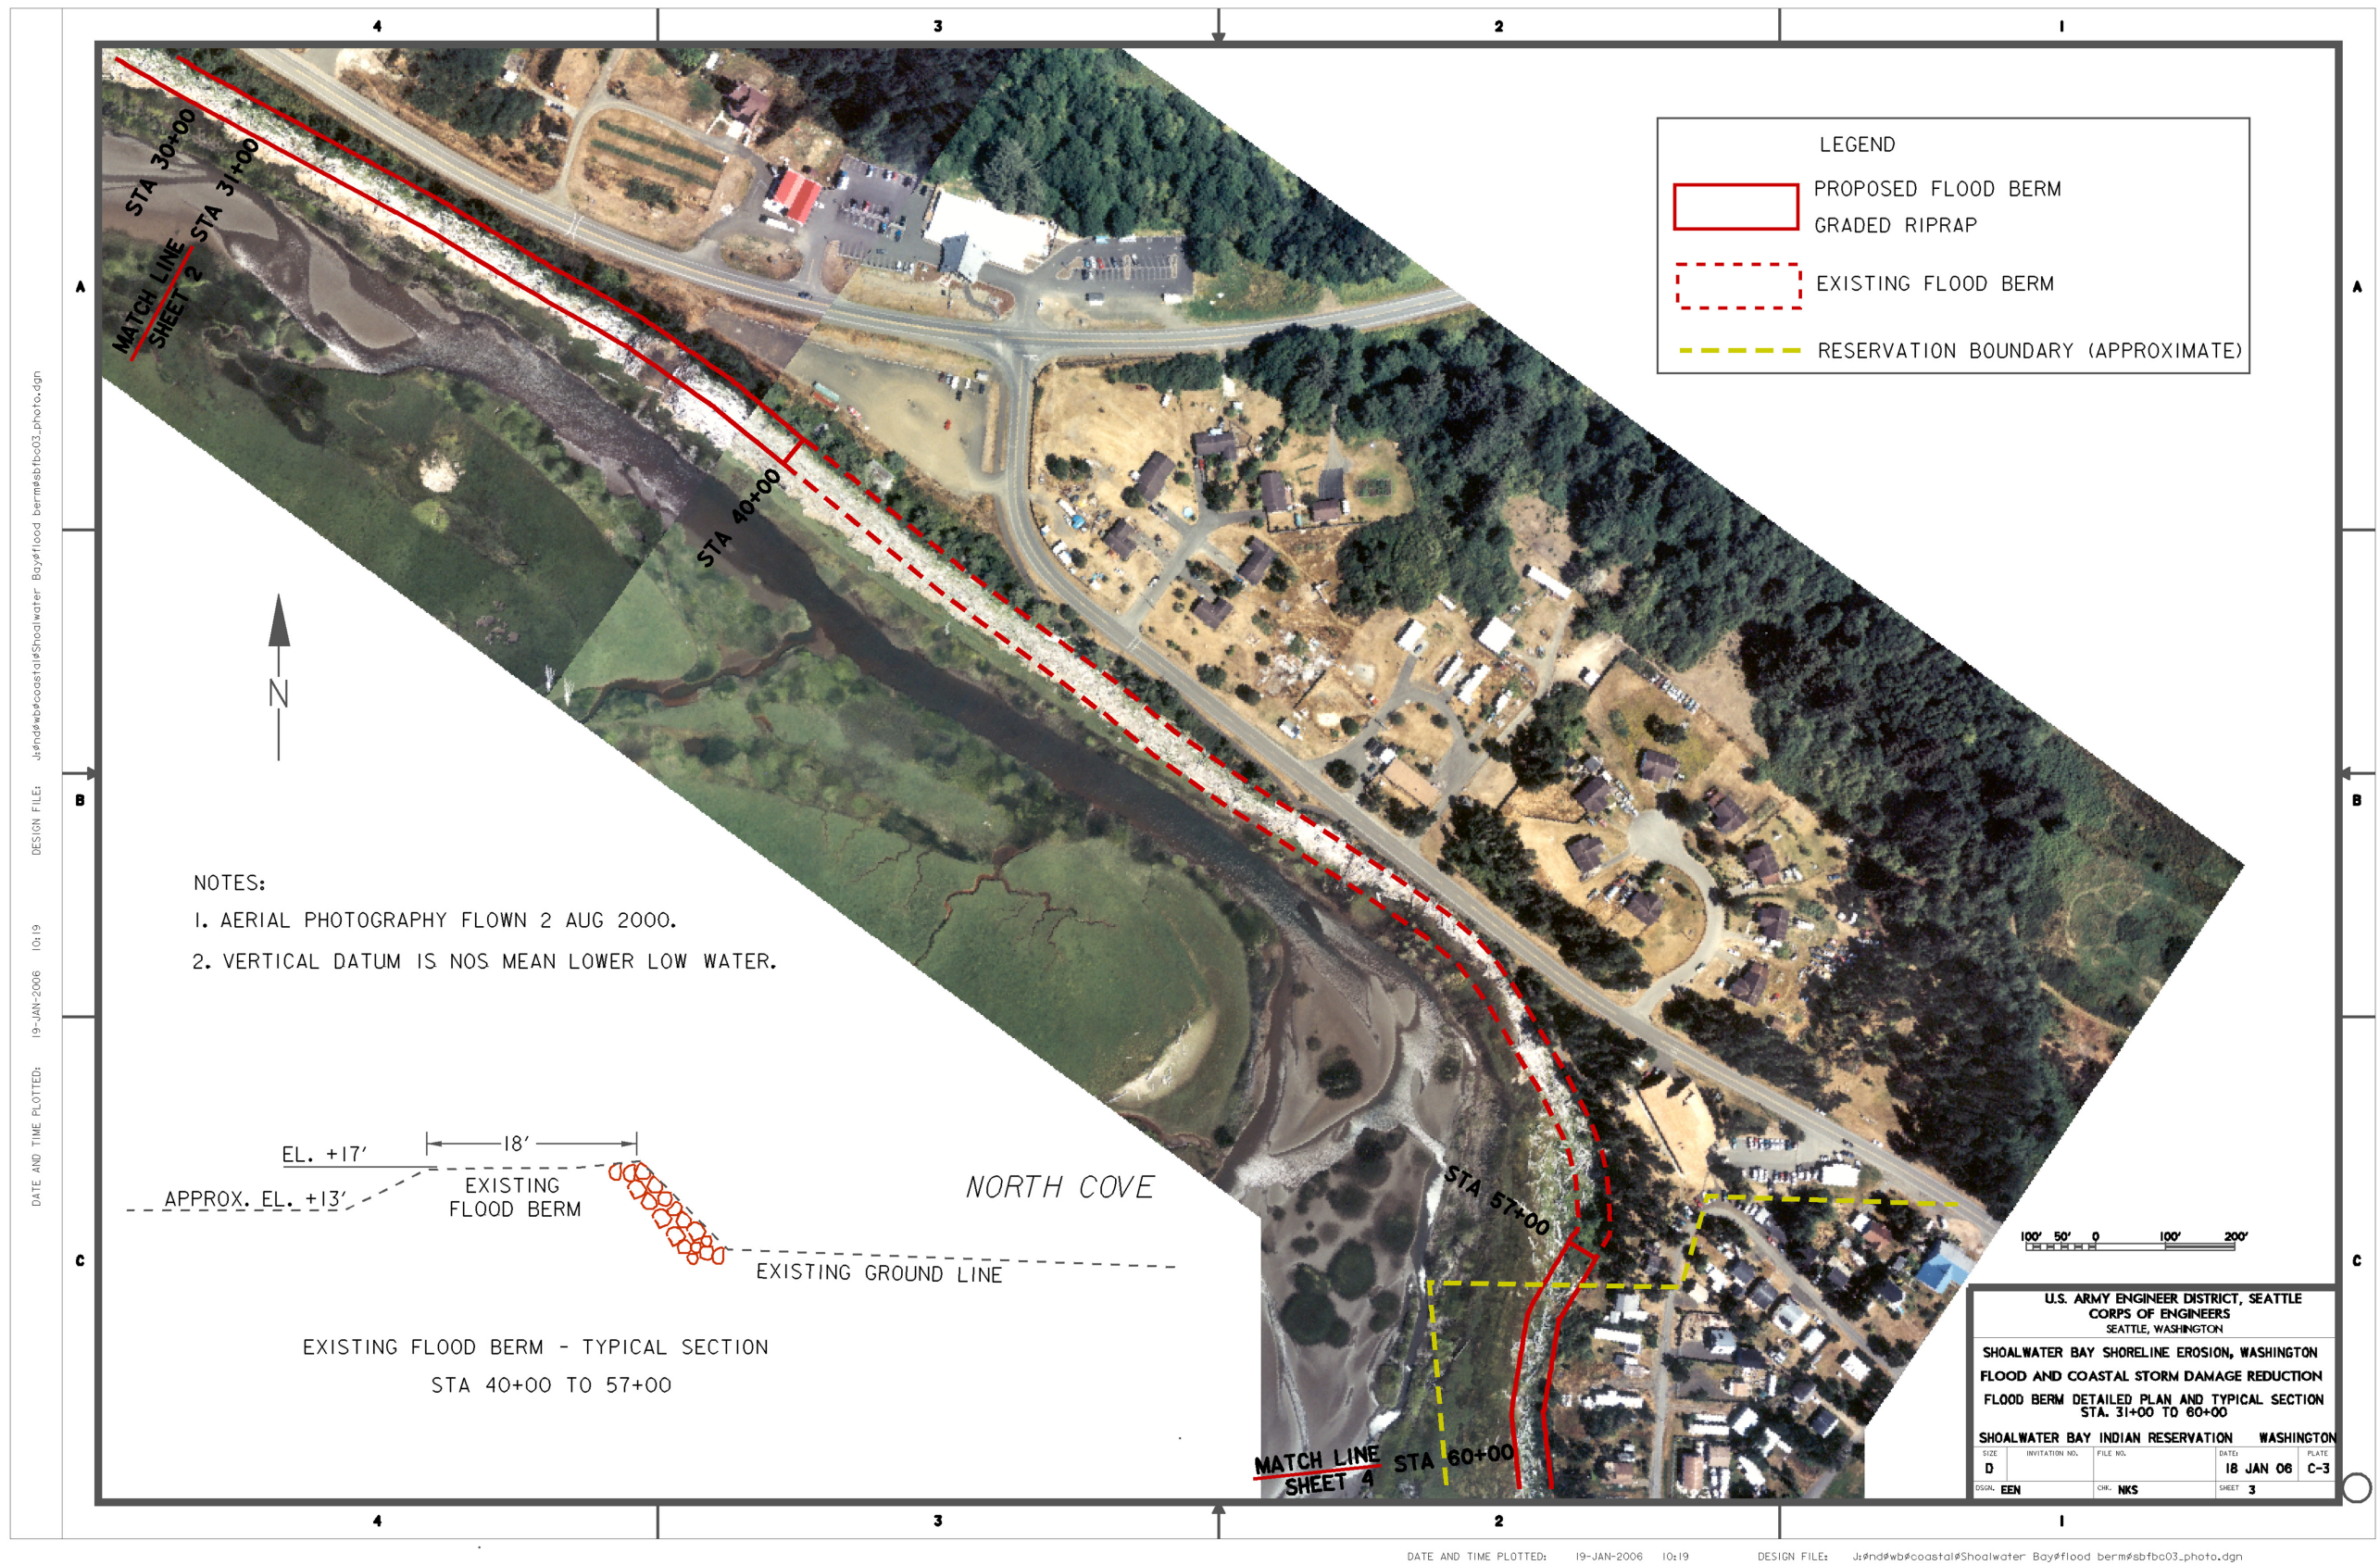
Flood berm detailed plan and typical section, station 31+00 to 60+00.
